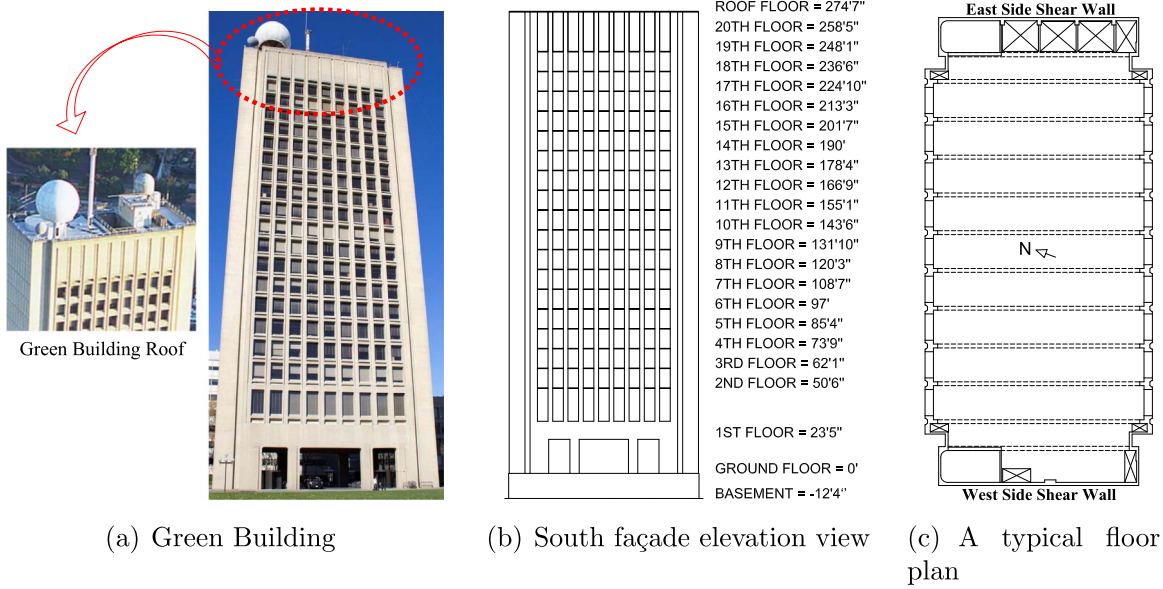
Green Building at the MIT campus. Note that the east and west sides are concrete shear walls. (a) Green Building (b) South façade elevation view (c) A typical floor plan.
